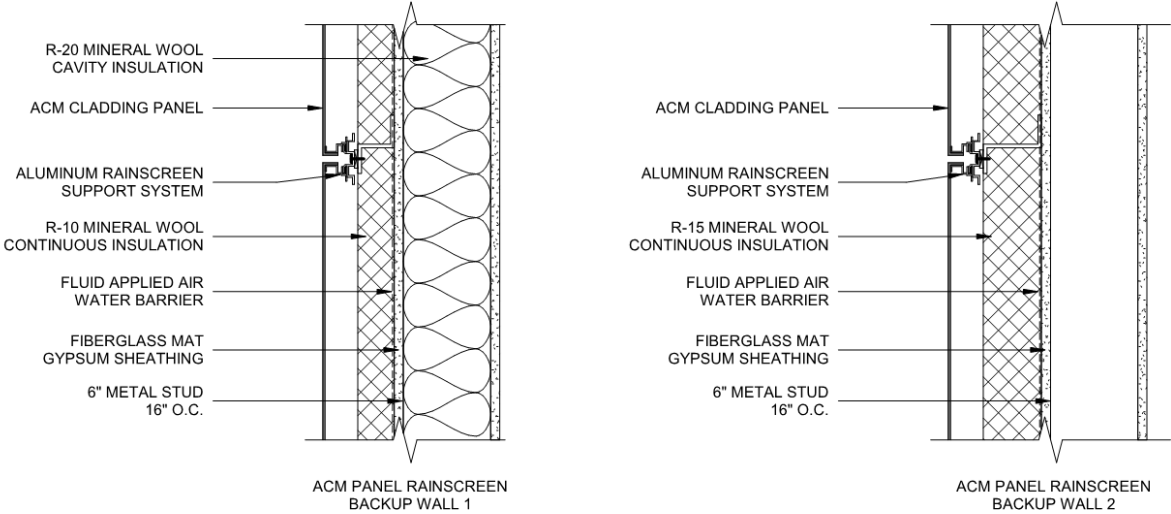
Section details of alternative wall type buildups for Study 4 (not to scale)
